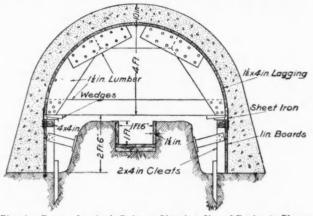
Forms for Arch Culvert, Showing Use of Drainage Flume
